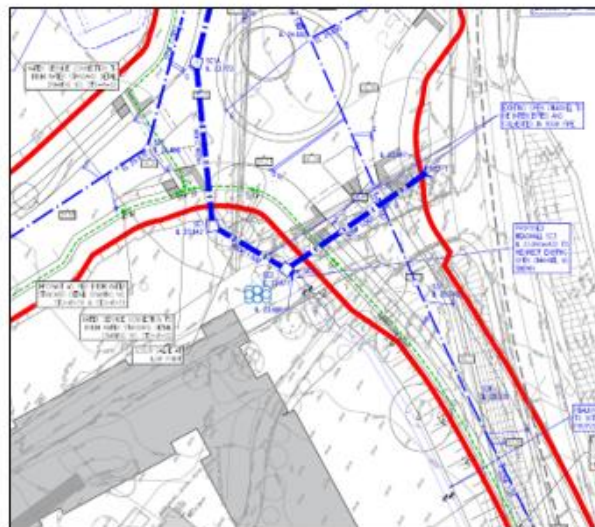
Extract of Site Services Plan (sheet 7) showing proposed piped drain
